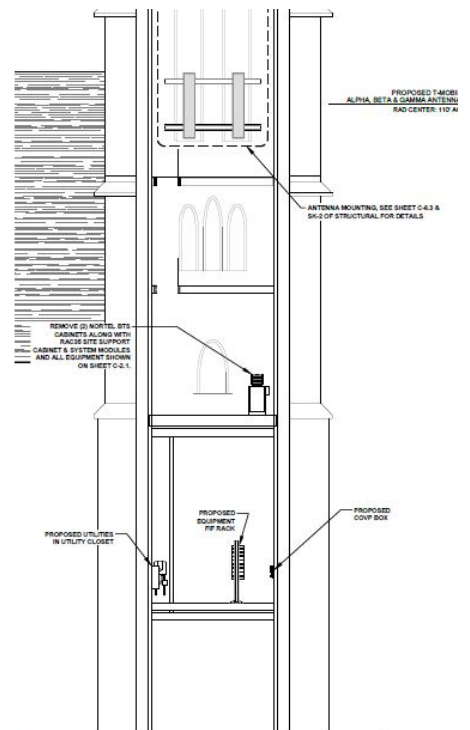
, by Applicant, C-5: Detail of west elevation depicting locations of antennas and interior equipment to be relocated from 3rd floor to 2nd floor (previously approved COA in 2019), C-5
